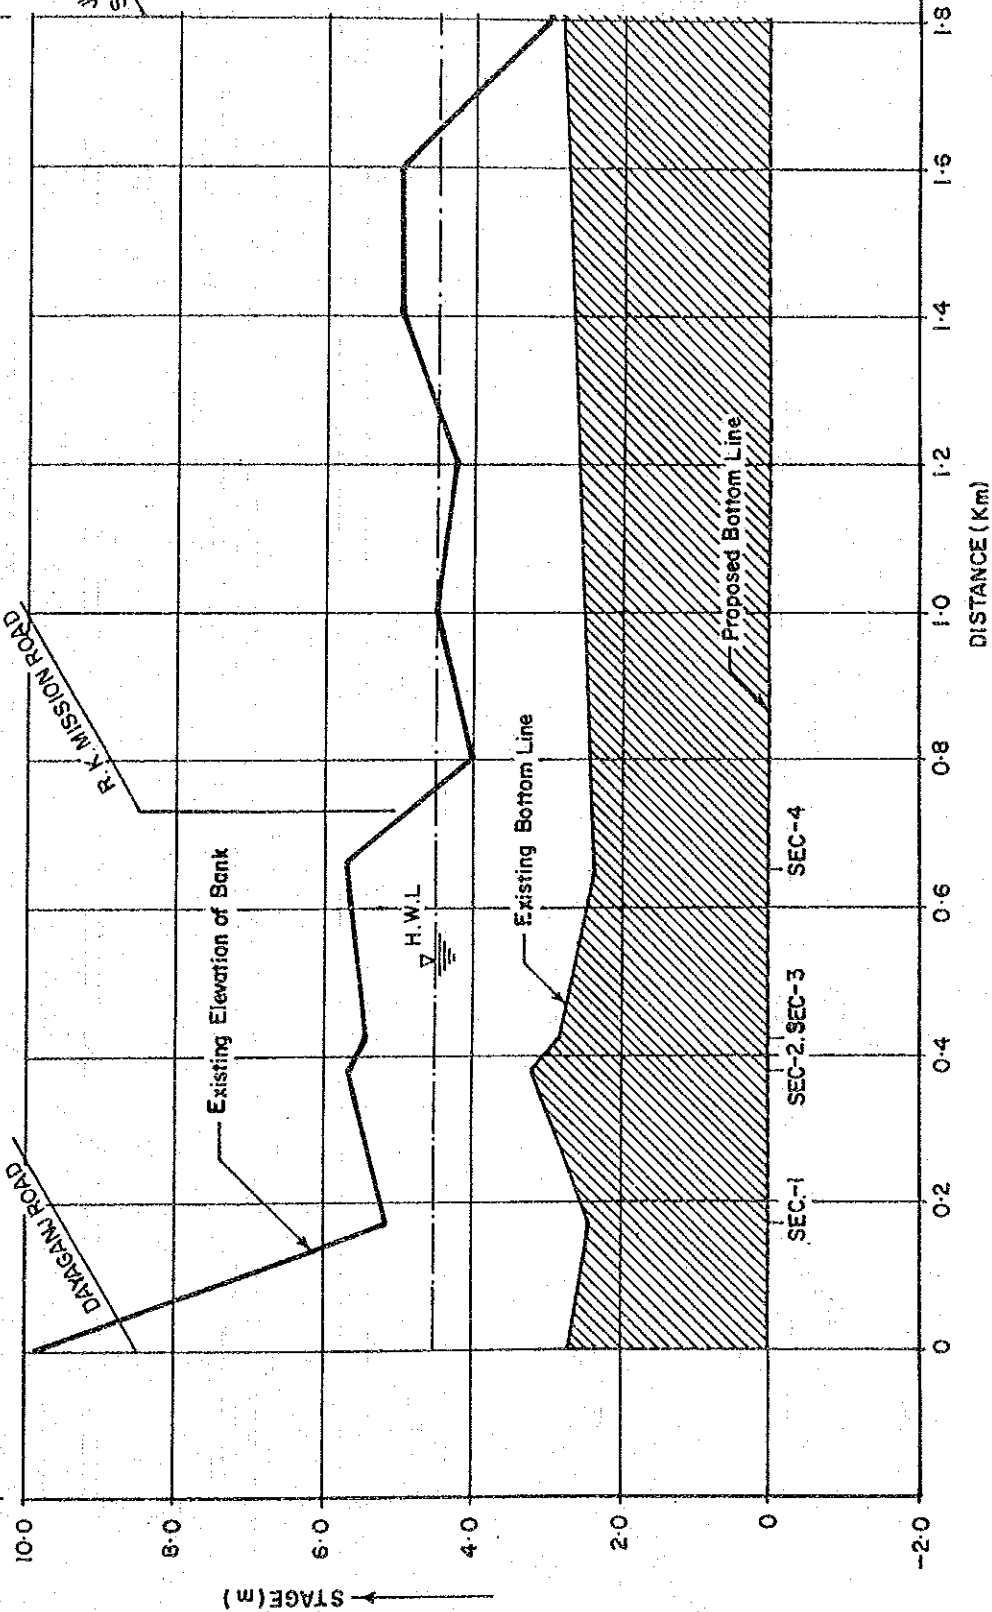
PROPOSED LONGITUDINAL AND CROSS SECTION OF GERANI KHAL
